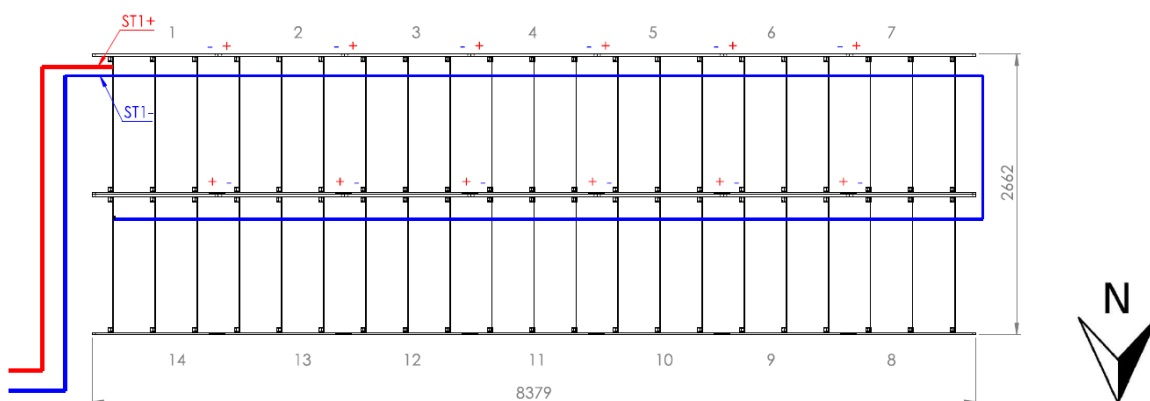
Layout and string diagram of the system with dimensions in millimeters.
